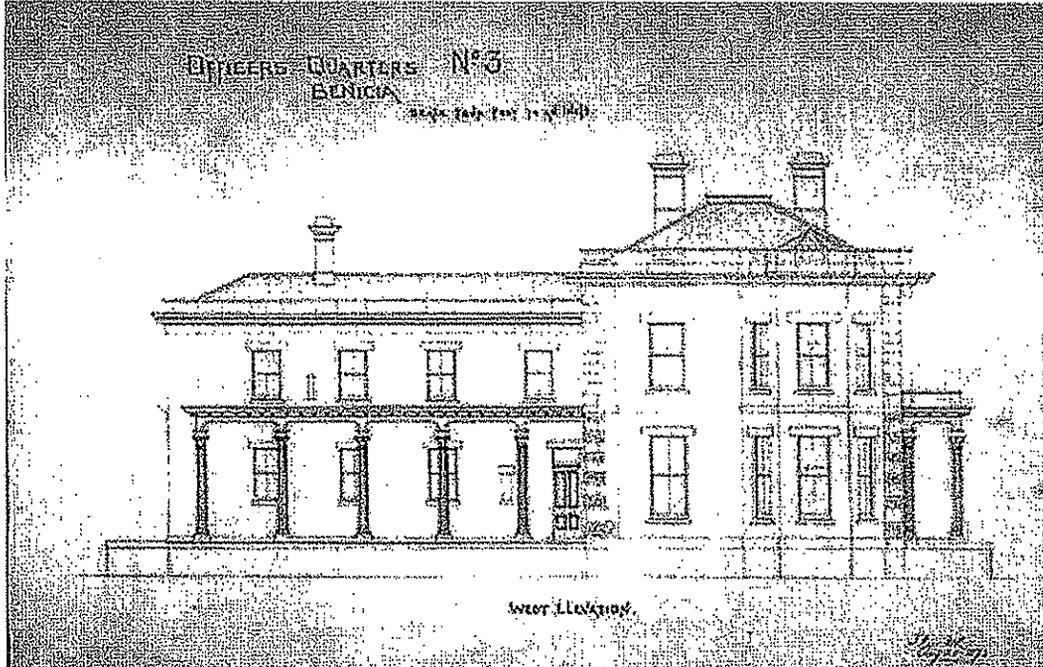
West elevation Officers Quarters Duplex, 1873. This porch is now partially enclosed. HABS Collection.
